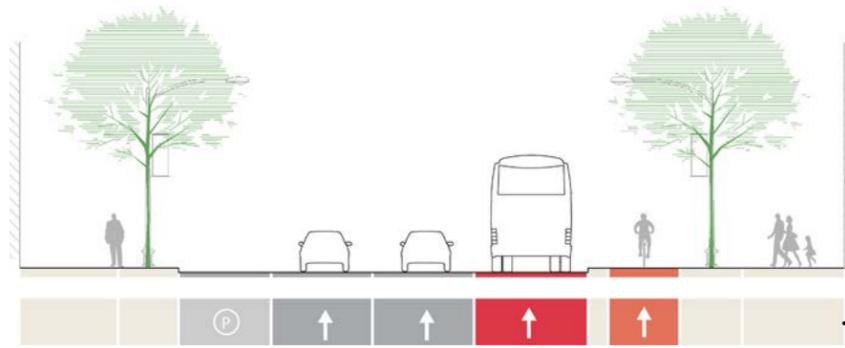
Sixth Street typical section Nueces Street to Bowie Street
